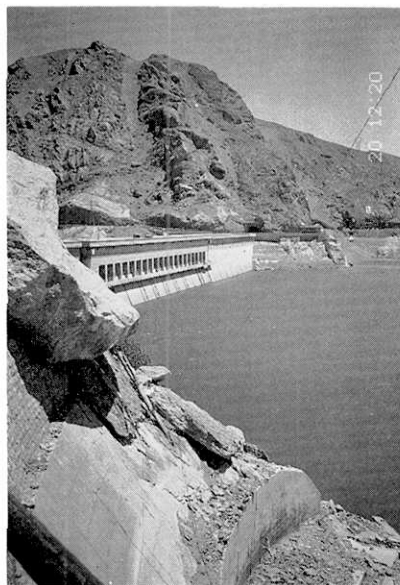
Huge rock fallen on the dam site (the Sefidrud dam) (Site No. 7 in Fig. 6).
